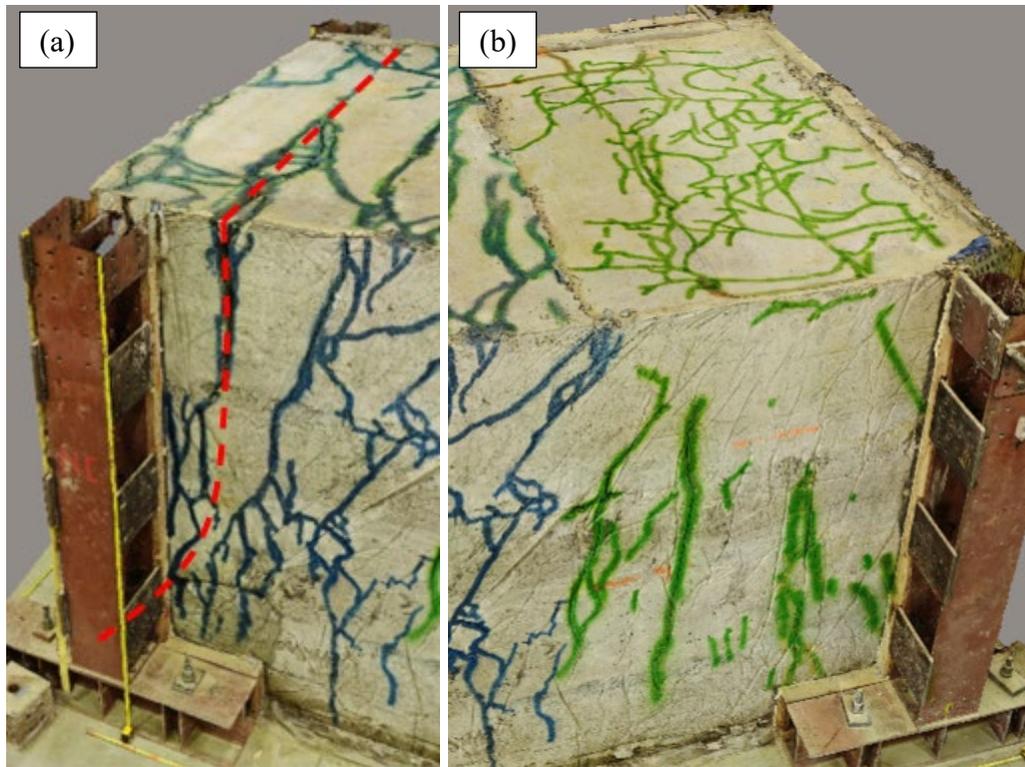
Three-dimensional point cloud models of (a) crack patterns due to surcharge loading near the free face without a wall and (b) crack patterns due to surcharge loading near the MSE wall. ([URL for interactive 3D point cloud models](#)).
